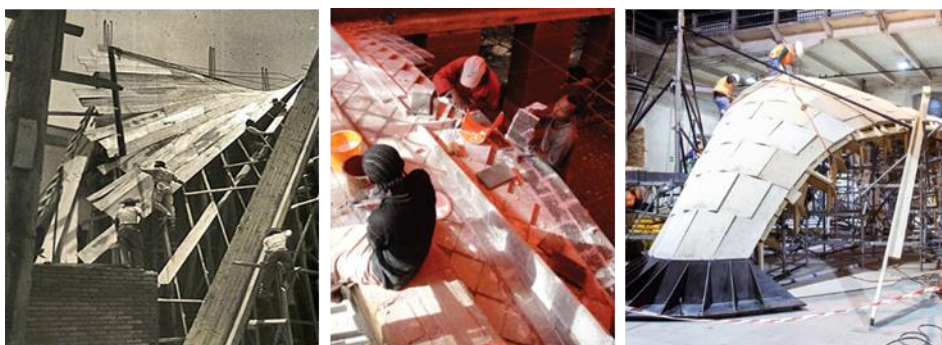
a) Candela's construction formwork wedge b) Sustainable Urban Dwelling (SUDU) c) Armadillo Vault
